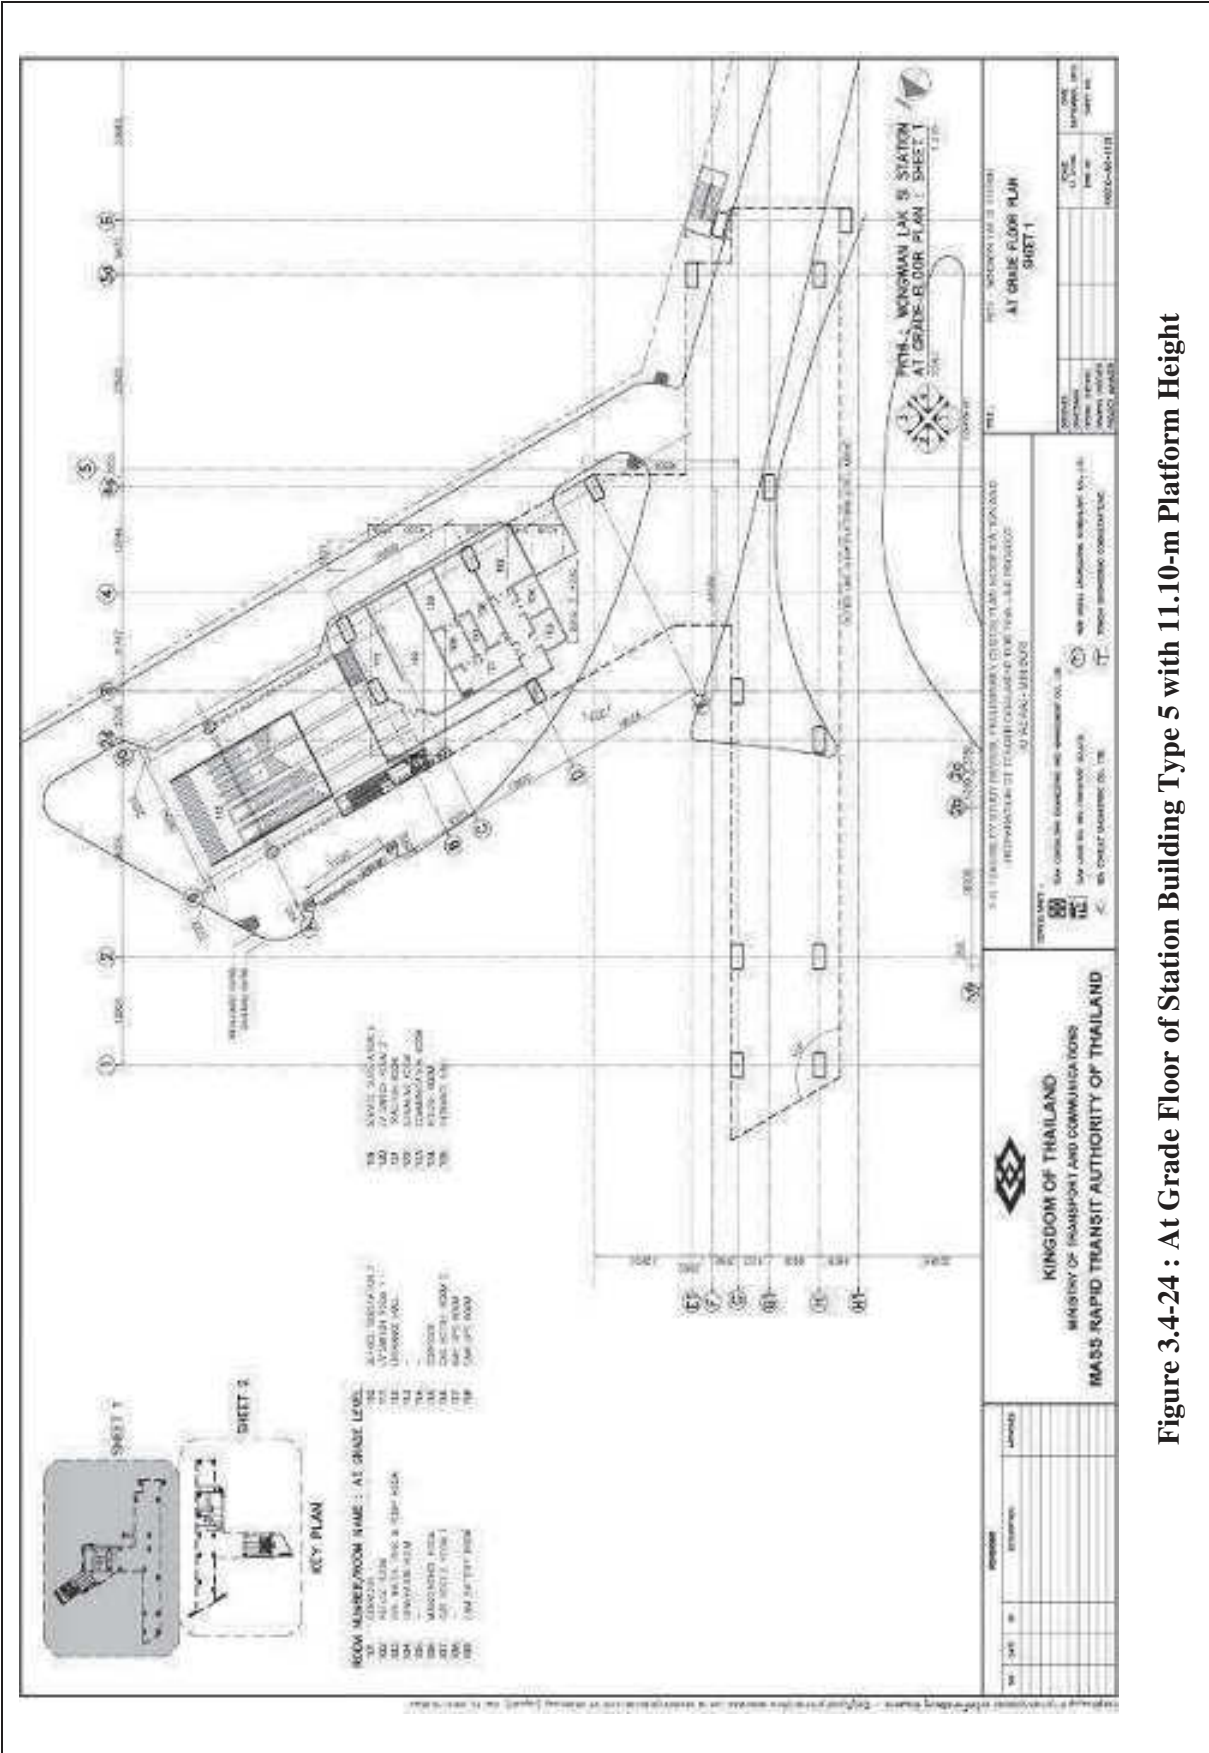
At Grade Floor of Station Building Type 5 with 11.10-m Platform Height
